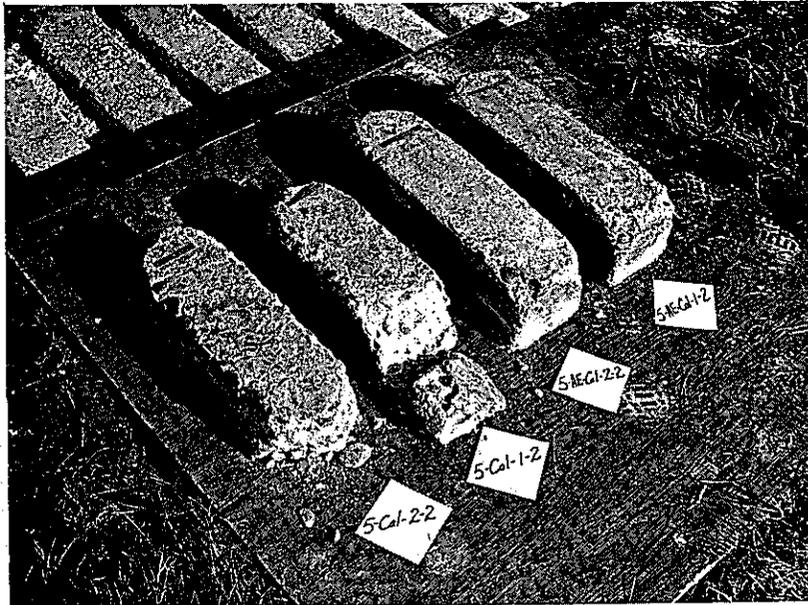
5-sack, Type II cement concrete after 36 months of sulfate exposure. Nonair-entrained concrete on left and air-entrained concrete on right.
